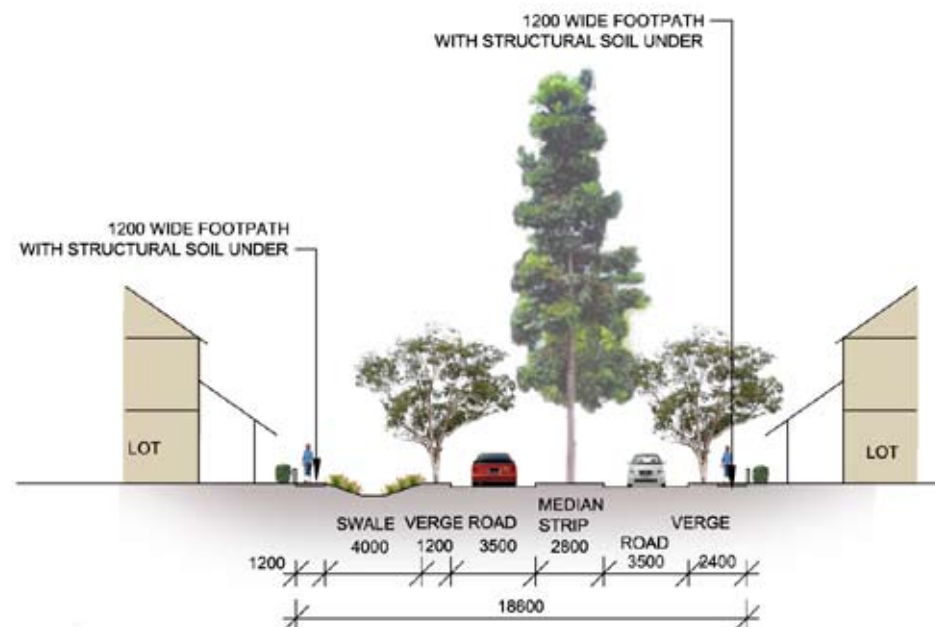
Identity planting at Cooper Road and new secondary local street
